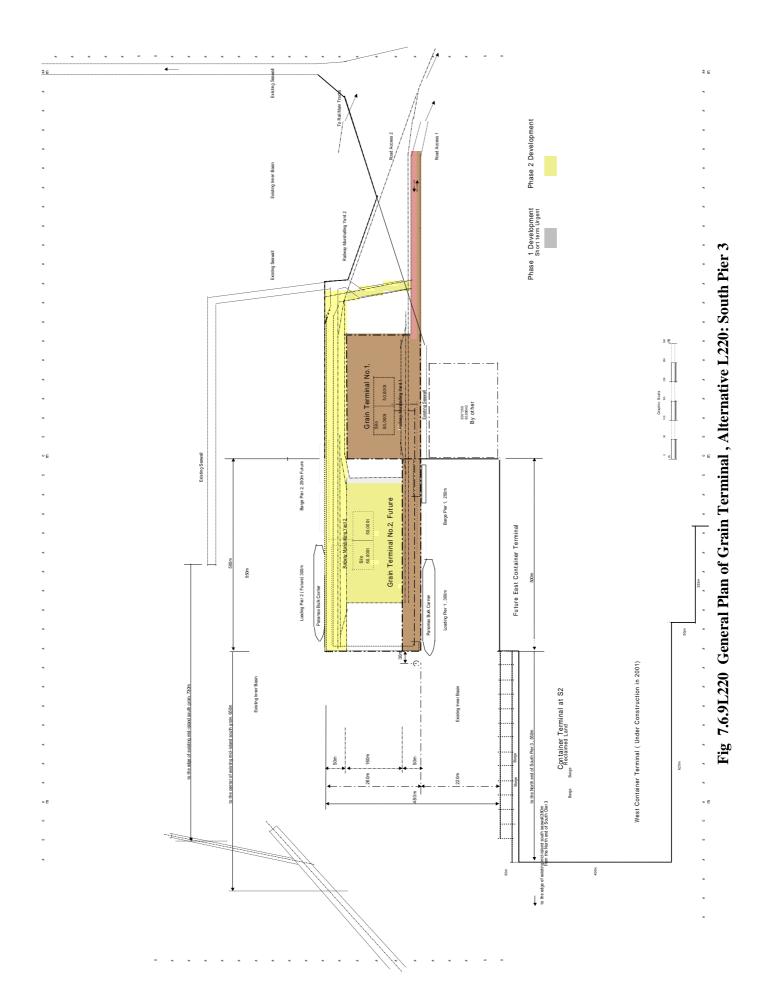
General Plan of Grain Terminal, Alternative B2: South Pier 3
